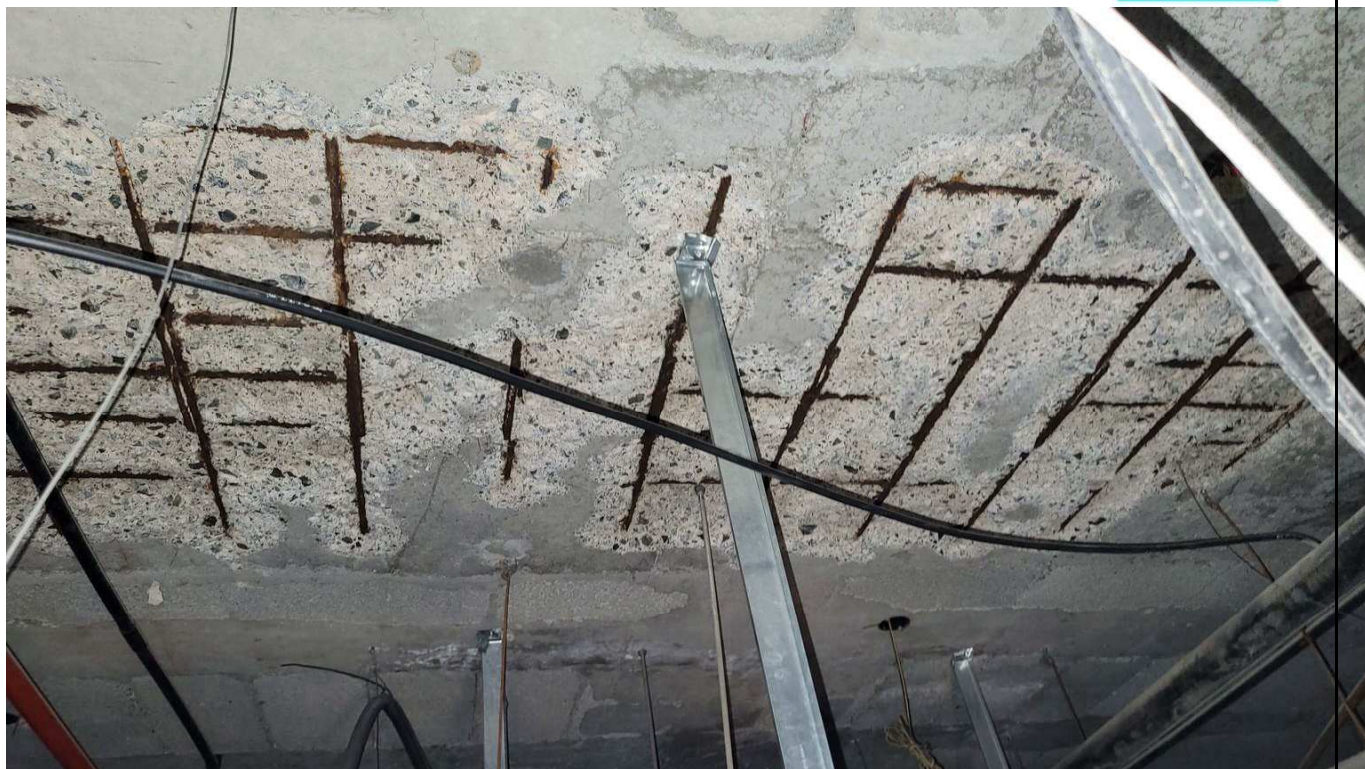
Steel reinforcements exposure with corrosion in slab soffit
